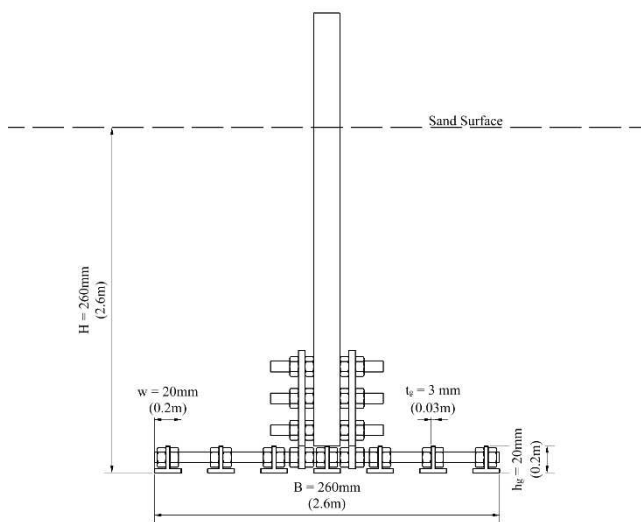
Dimension of assembled model grillage (assumed prototype dimensions shown in brackets).
